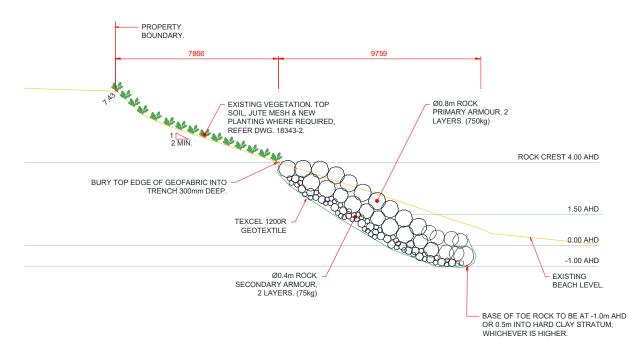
Detailed design revetment cross section by Magryn (Note indicative natural profile alignment relative to revetment armour alignment)
